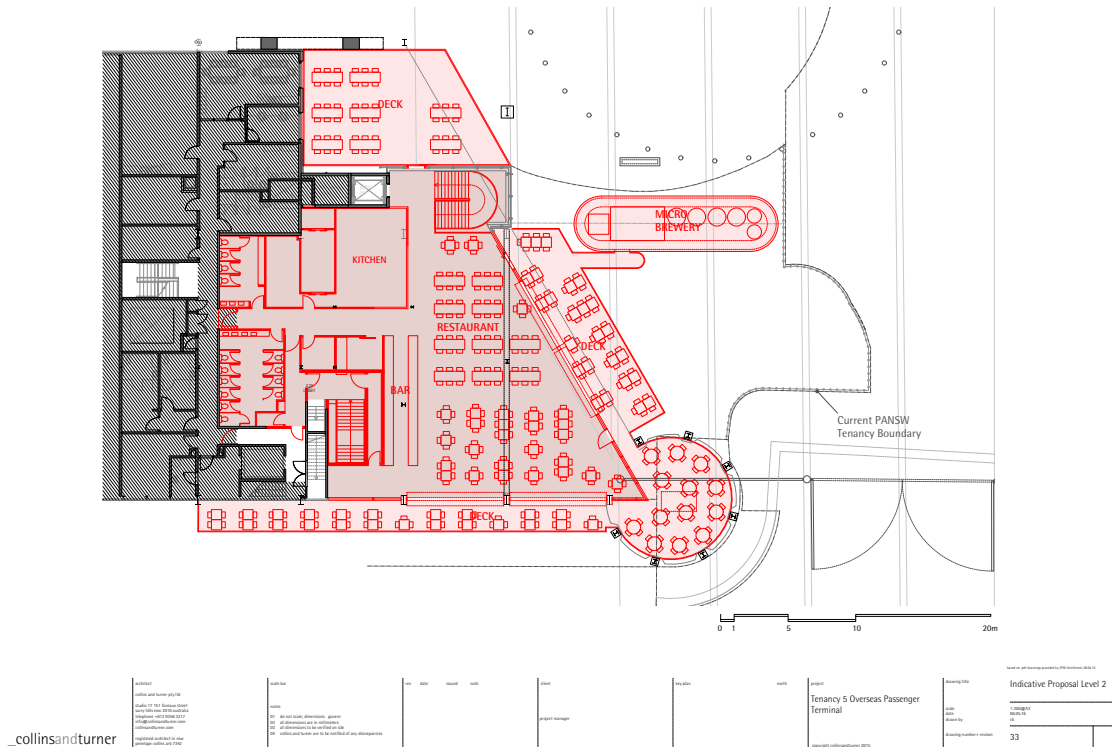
Tenancy 5 – Concept draft fitout – Level 2 (Source Collins and Turner)
